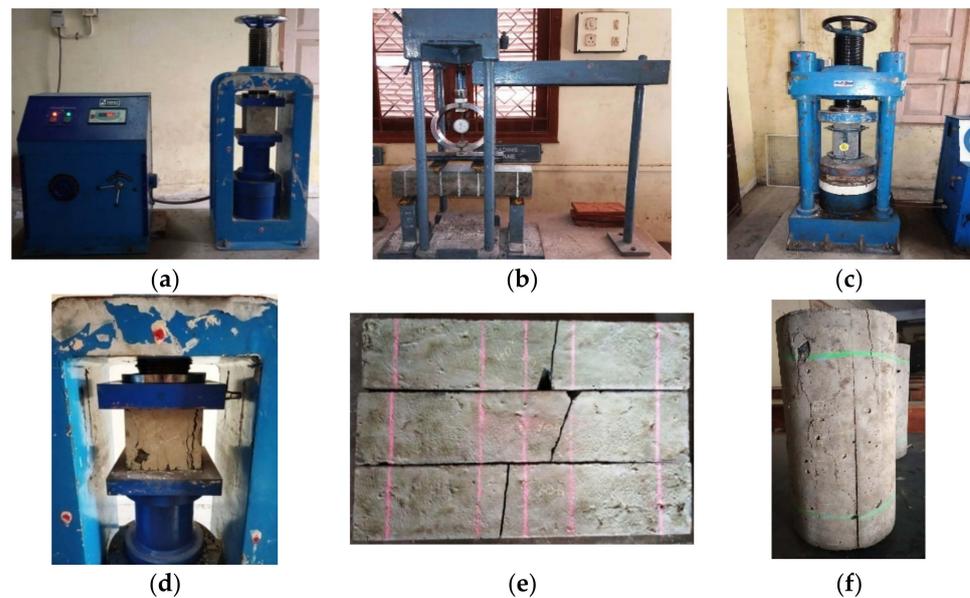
Testing of specimens in laboratory (a–c). Test setup of compression, flexure, and E-for concrete and (d–f) failure pattern of cube, prism, and cylinder.
